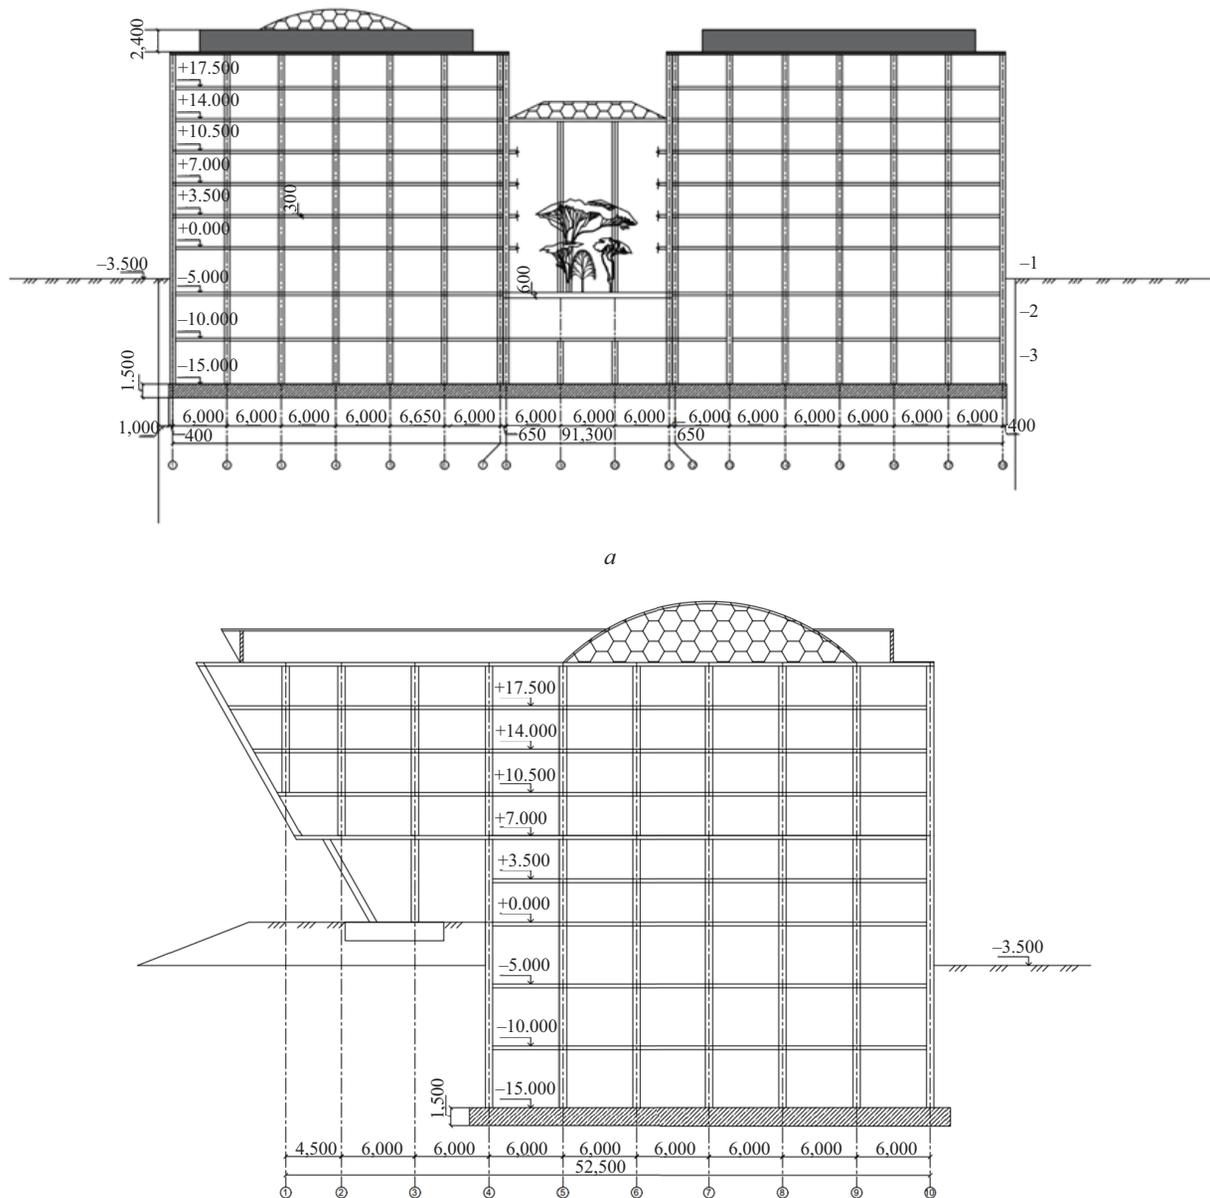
Cross-sections of the multifunctional complex: a — longitudinal section A-A; b — cross-section B-B
